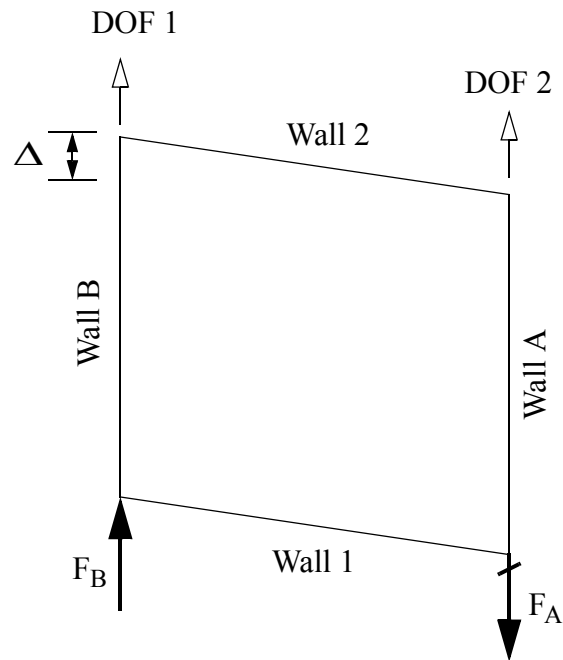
Schematic illustrating the deformed shape of the test structure during Test Runs 40 and 41.
